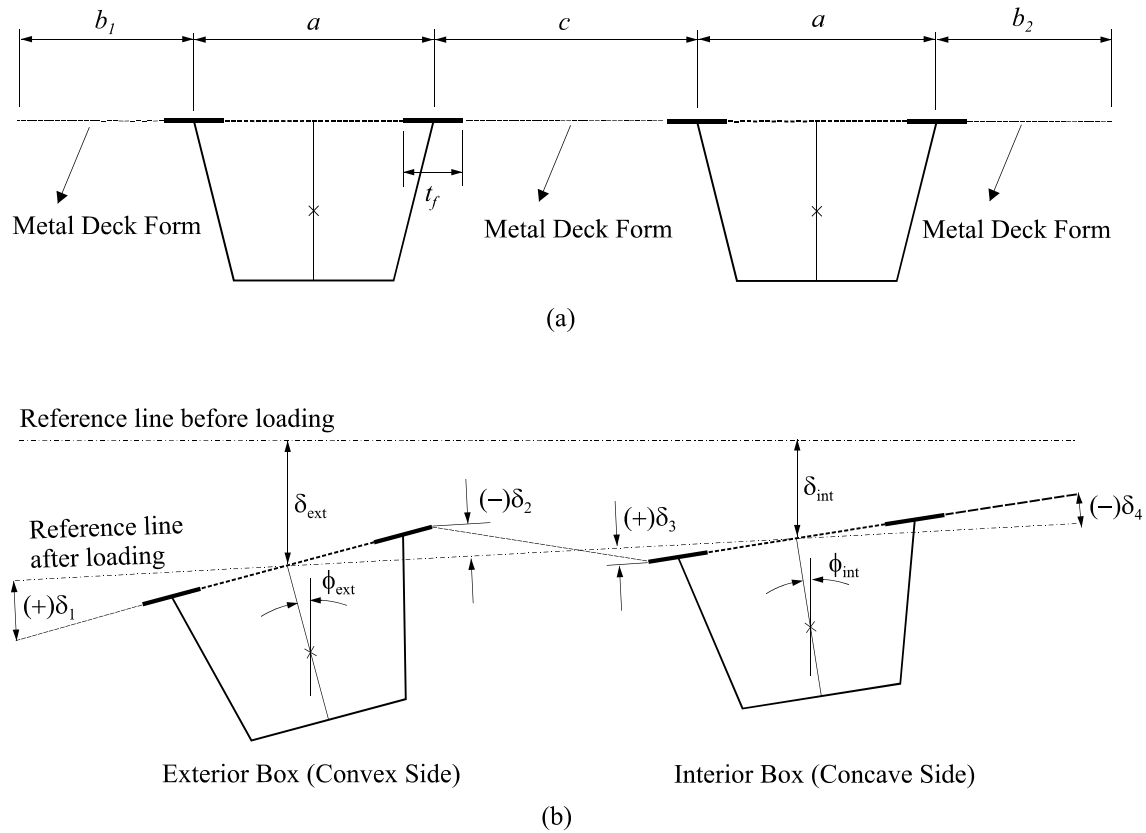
Notation for twin-box girder bridge cross-section: (a) Deck width; (b) Deformed shape
